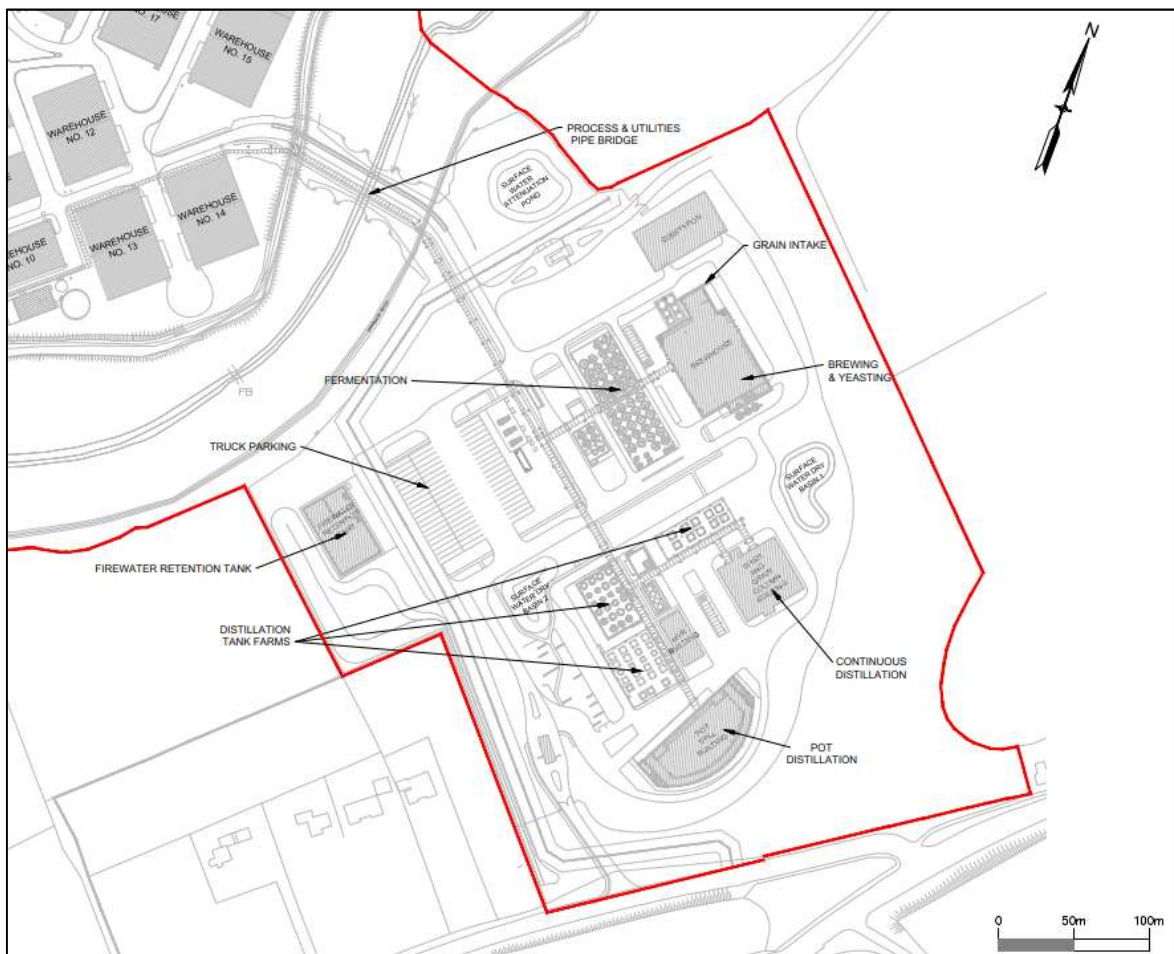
IDL Midleton, Proposed New Expansion Layout Plan, Proposed IE Licence Boundary in red
